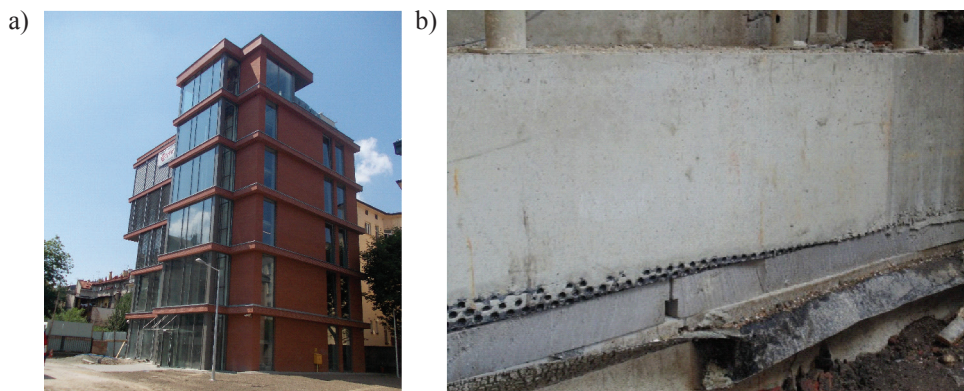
a) The view of completed building, b) the view of XPS layer under the foundation slab
